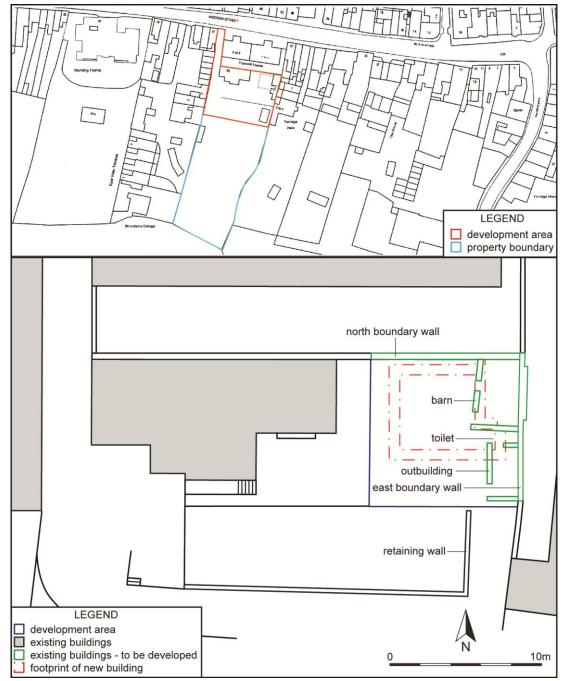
SITE PLAN SHOWING LOCATION OF WORKS CARRIED OUT.
